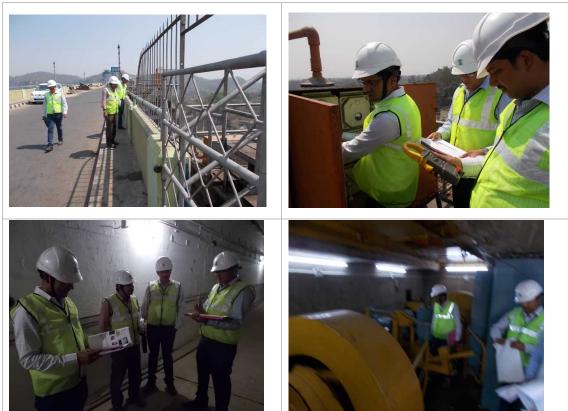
1st Inspection (Electric and Machine Engineering)
